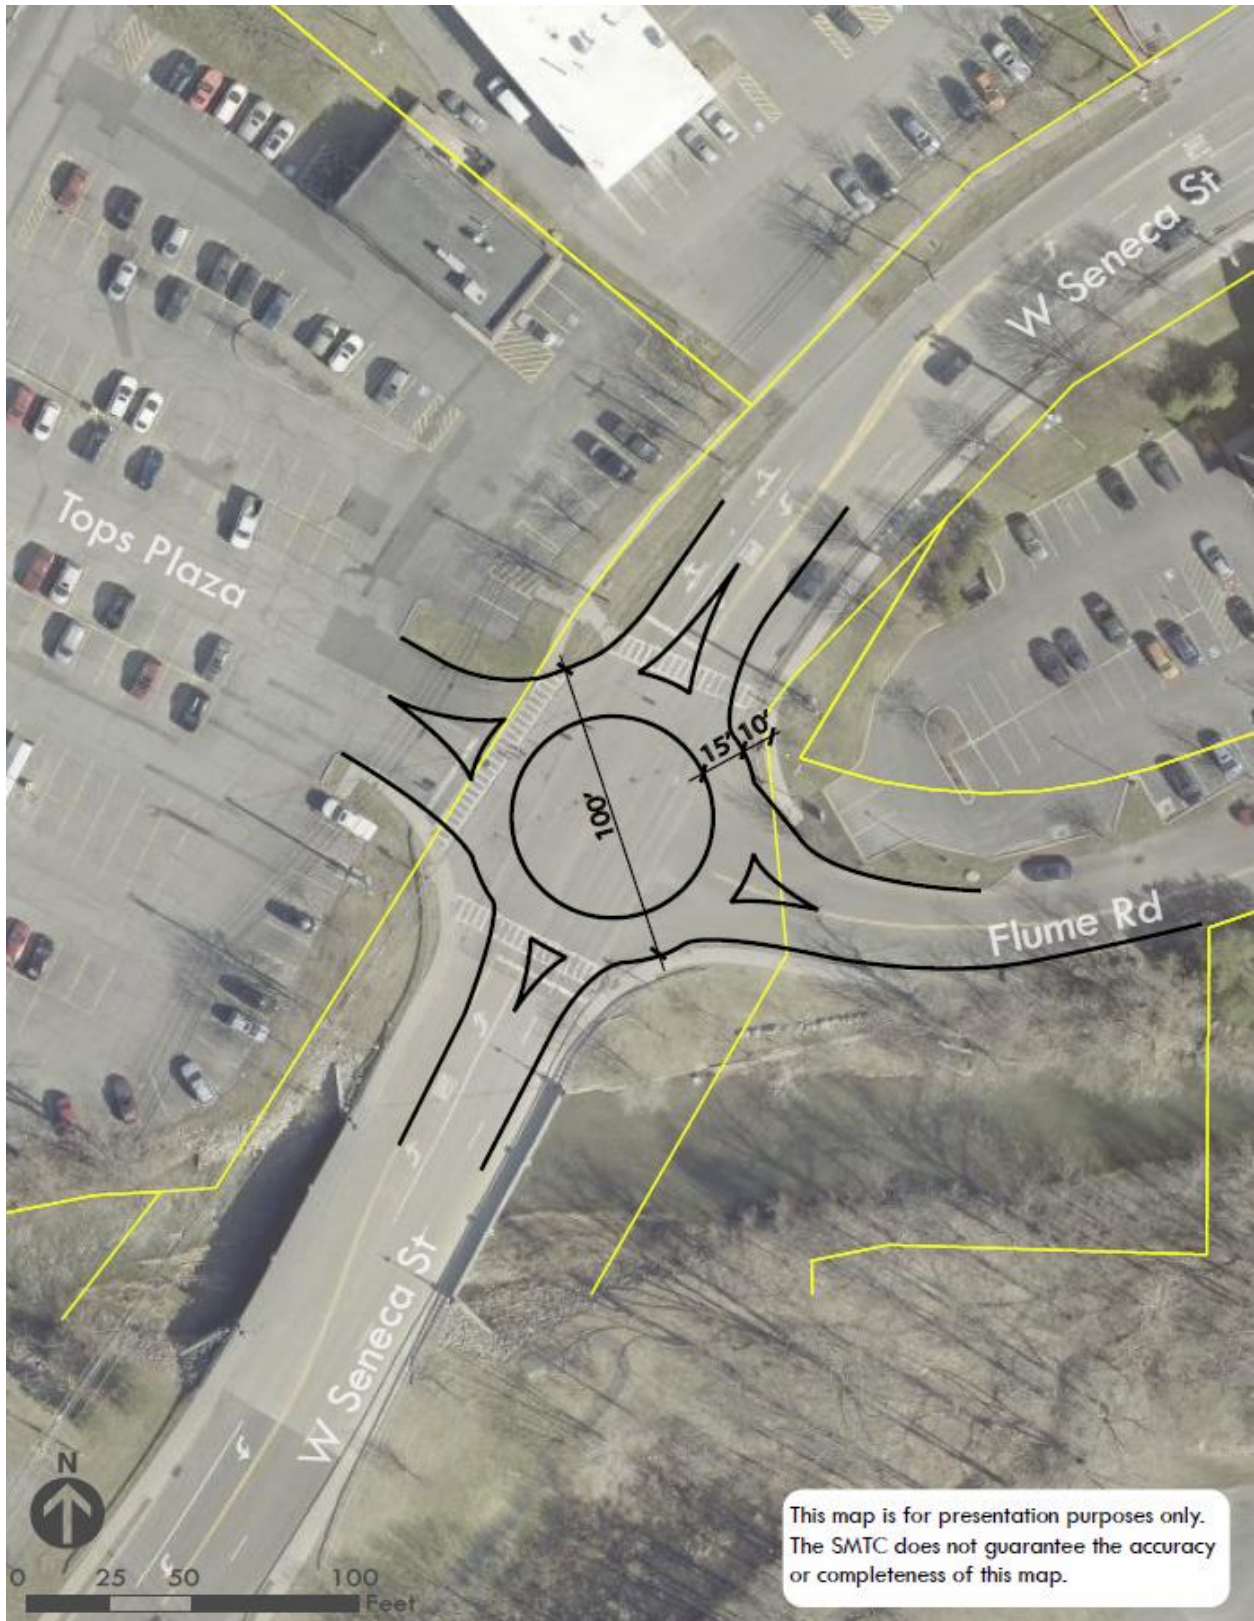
West Seneca Street/Flume Road Roundabout Geometry Screening Concept
